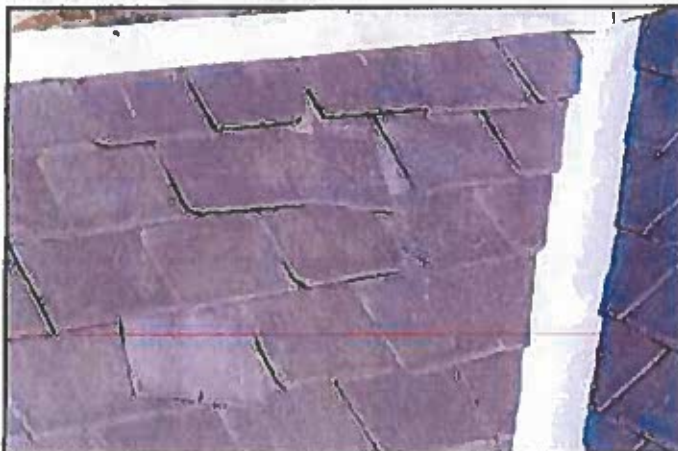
Slate defects - Slipped slates at top of valley shown in Photo 12 need to be refastened. This may be due to a failure of the nails to hold in the wood shingles below.
